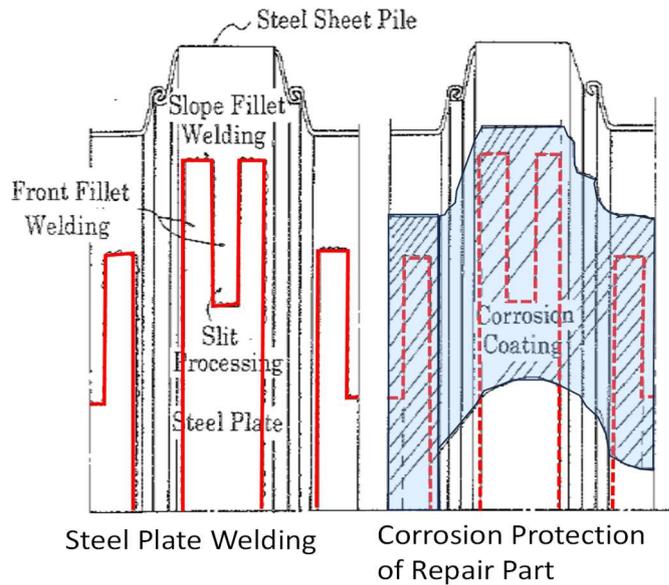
Example of repair and strengthening methods for steel sheet piles and steel pipe piles using steel plates
